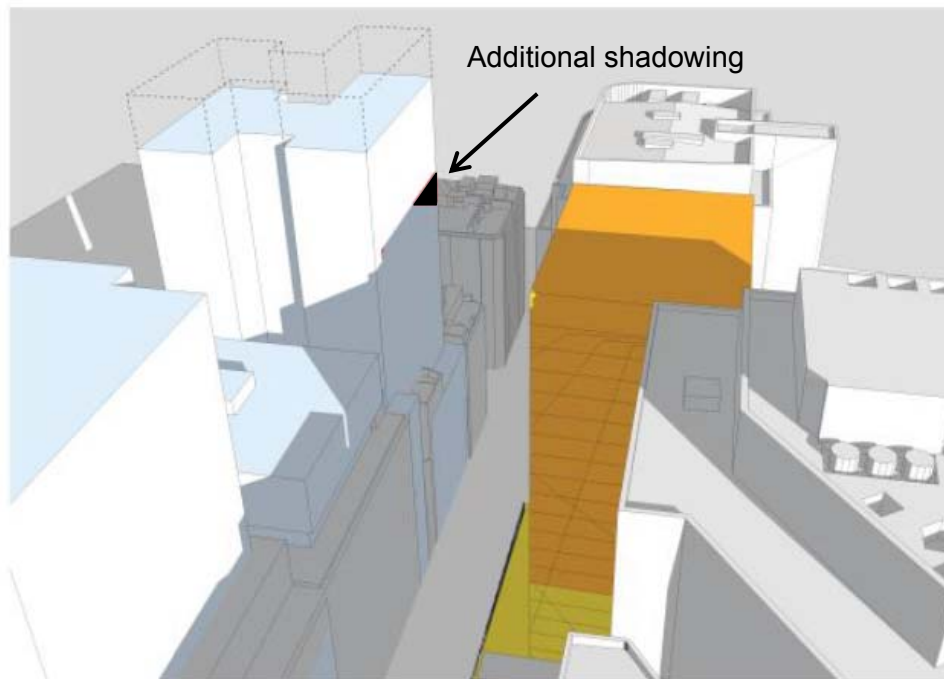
Additional over shadowing of 161 Clarence Street at 3pm
